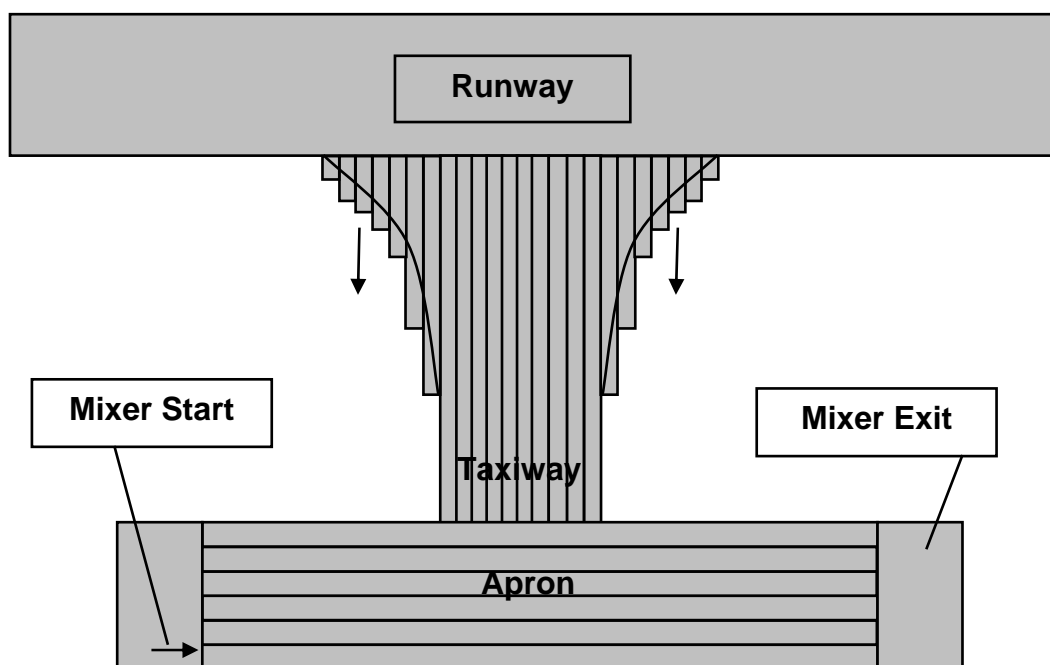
Layout of mixing lanes, mixing directions, and the mixer lanes used to create the curved fillets. (Drawing is not to scale.)
